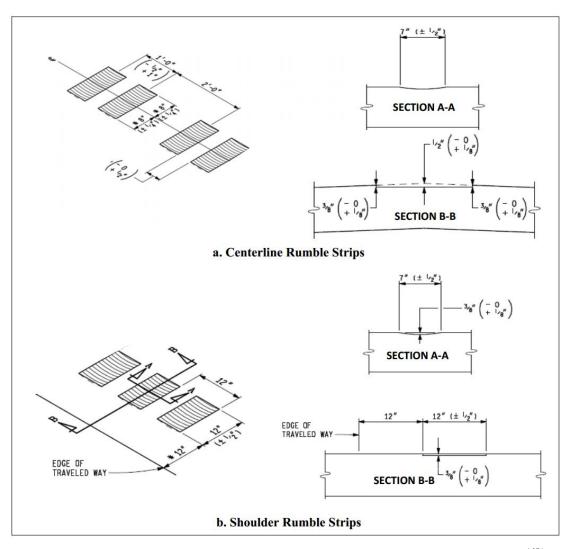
MDOT Rumble Strip Standards for Rural Non-Freeway Roadways (49)
